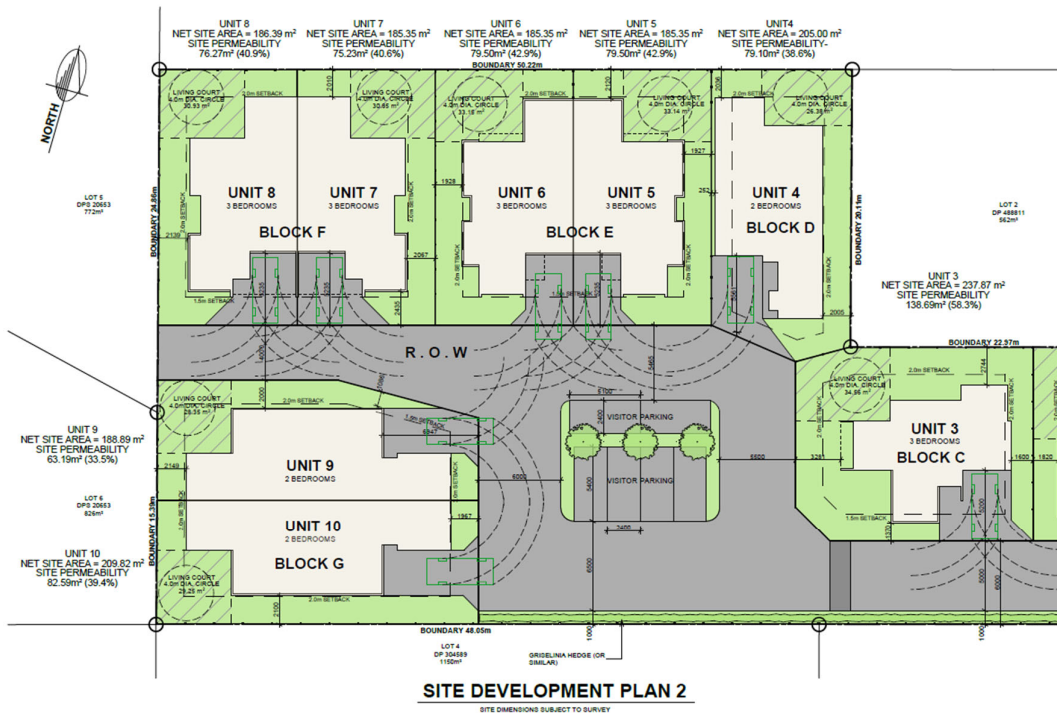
PROPOSED SITE DEVELOPMENT PLAN (WESTERN PORTION) – 9 APRIL 2021
